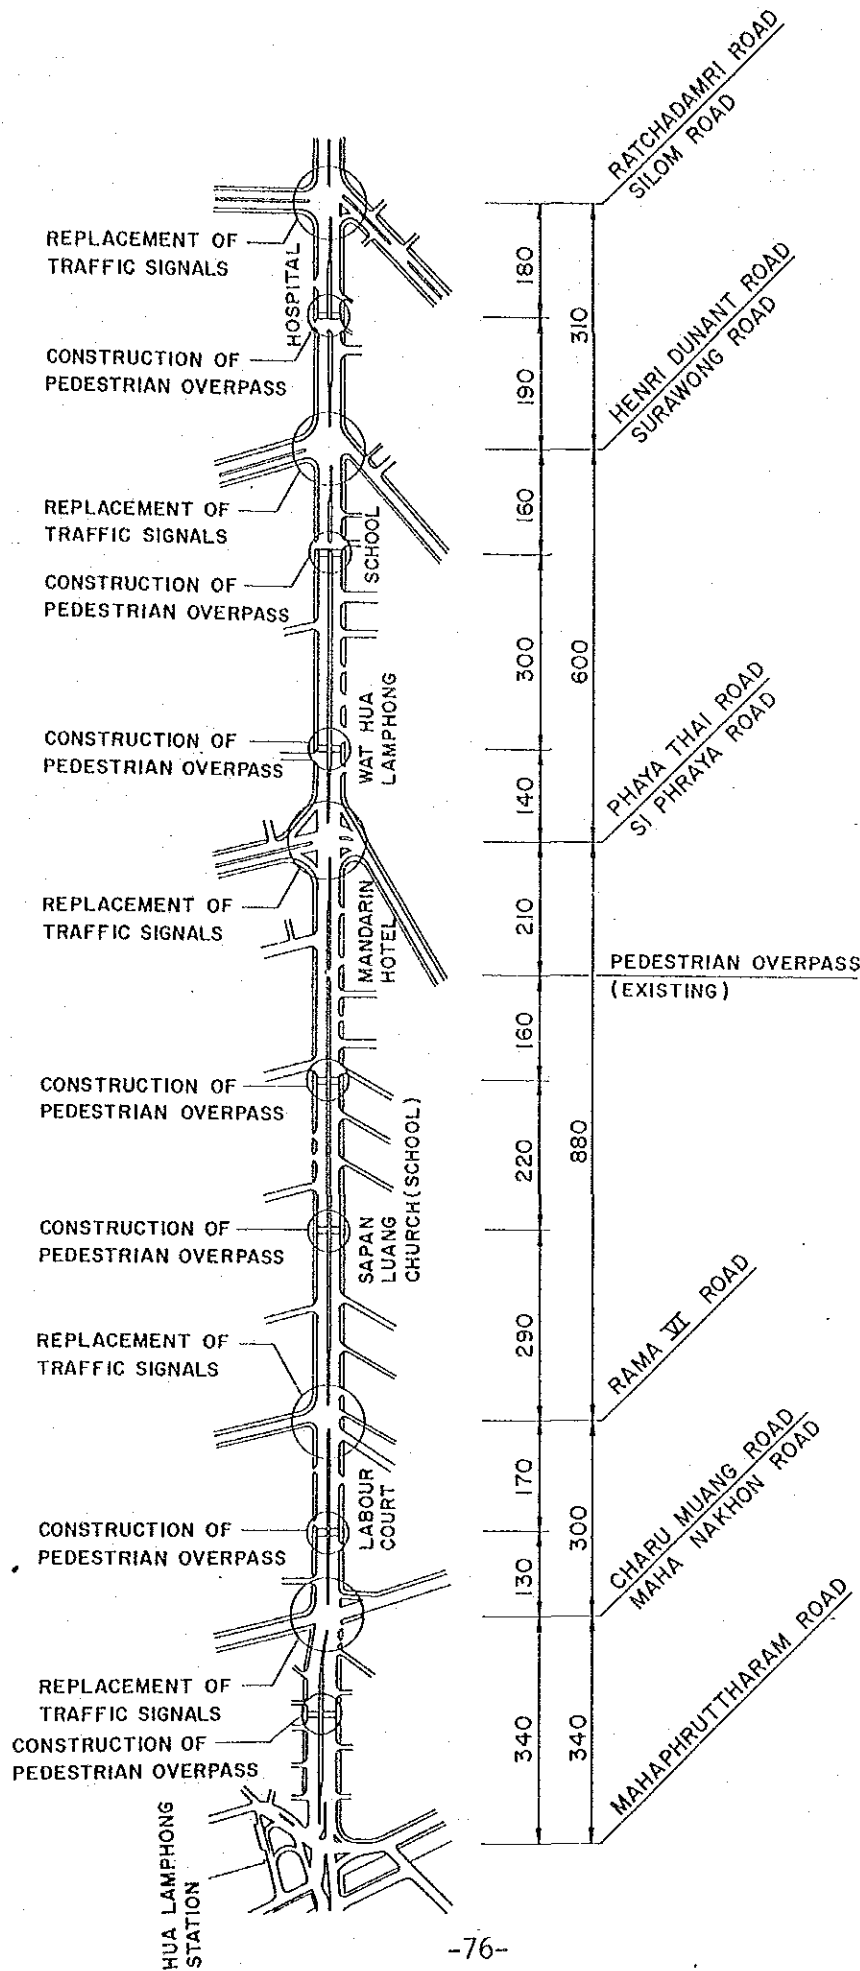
Proposed Safety Plan for Rama IV Road
